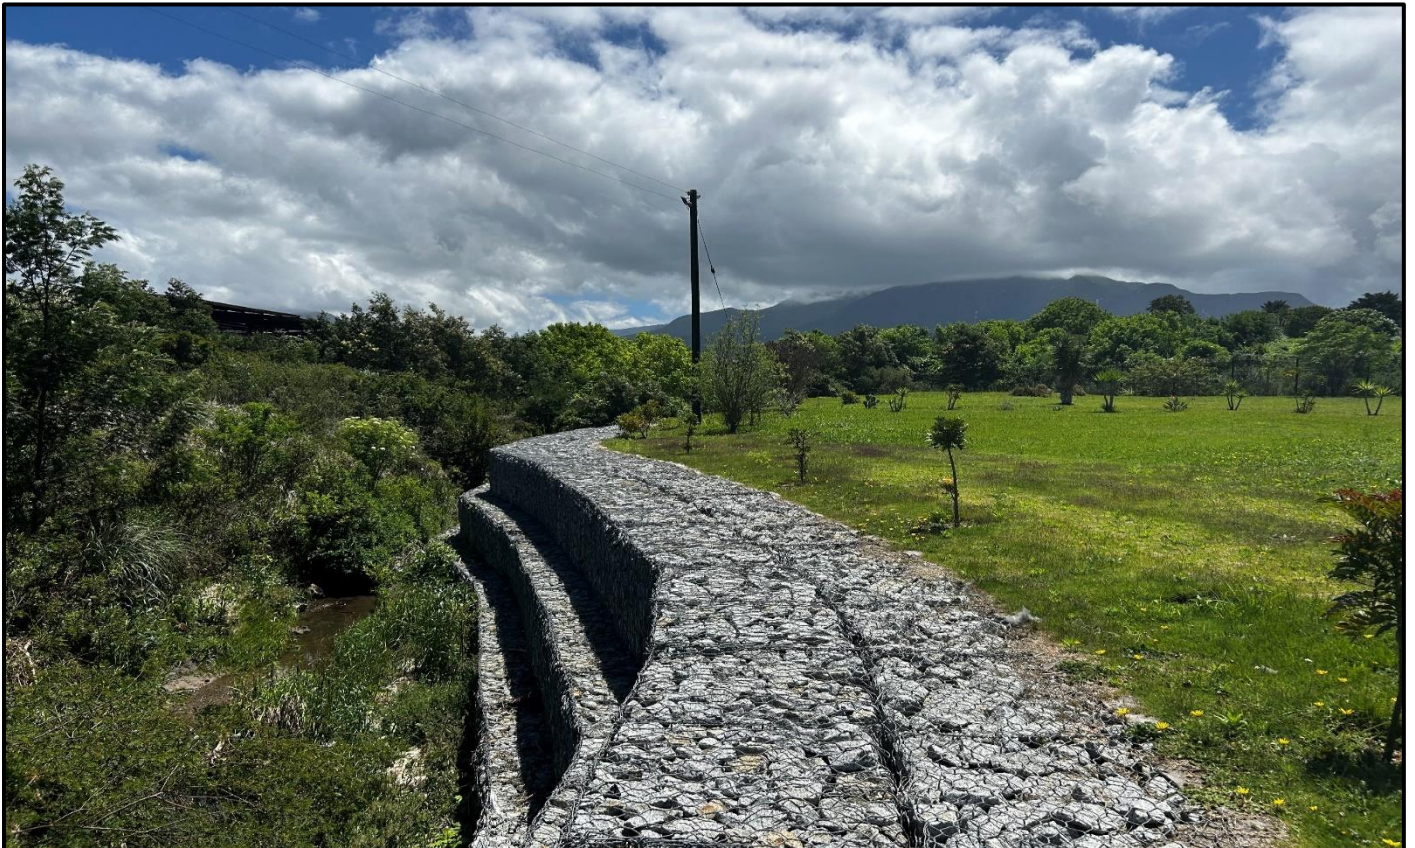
Gabions that have been installed, work area that has been rehabilitated and trees that have been planted.
